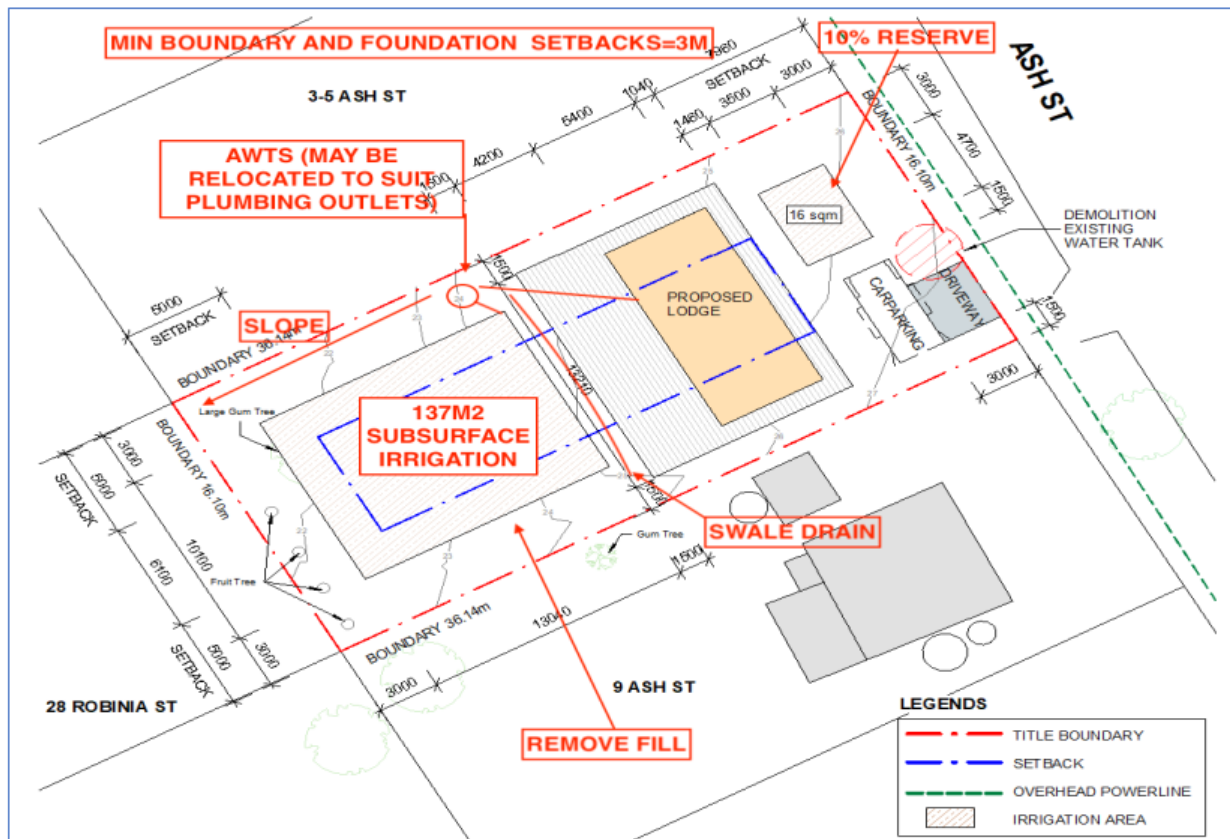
Notated Site Plan for 7 Ash Street to include specific details and construction notes by suitably qualified person (From Appendix 2 of Site and Soil Evaluation and Onsite Wastewater System Design – 7 Ash Street Primrose Sands).
